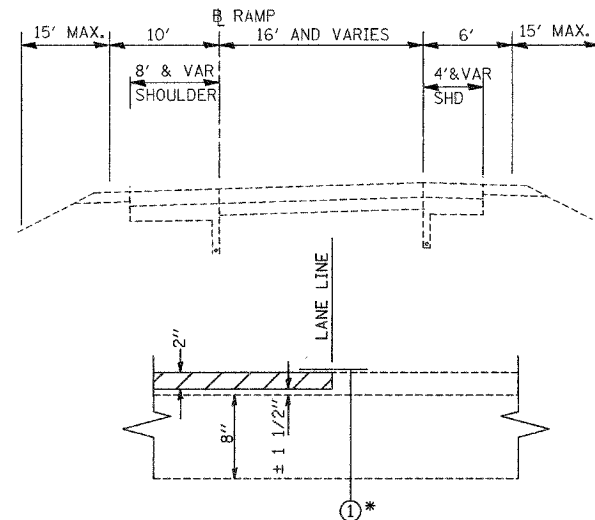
DETAIL C (EXISTING CONCRETE PAVEMENT AREA)
